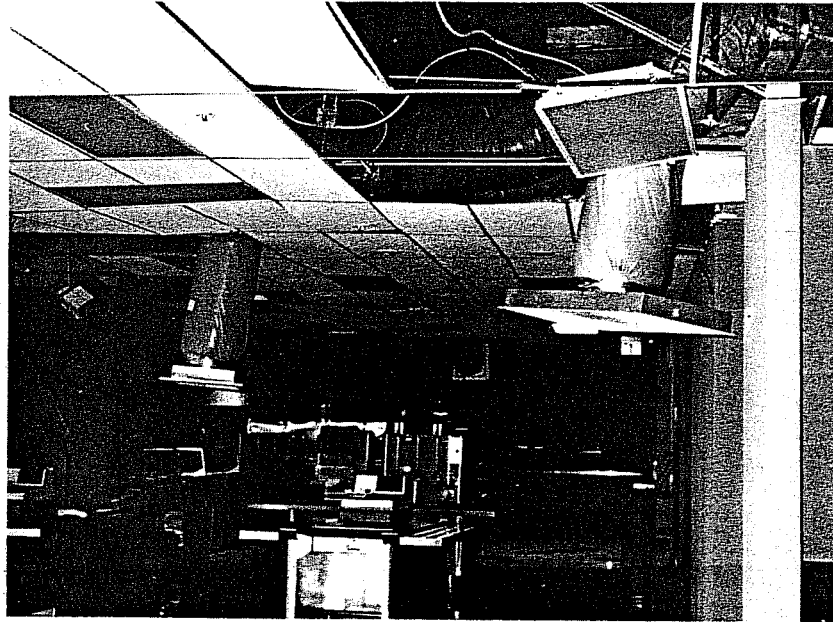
Dislodged Lights and Ventilation Diffusers (Ref. 3)
